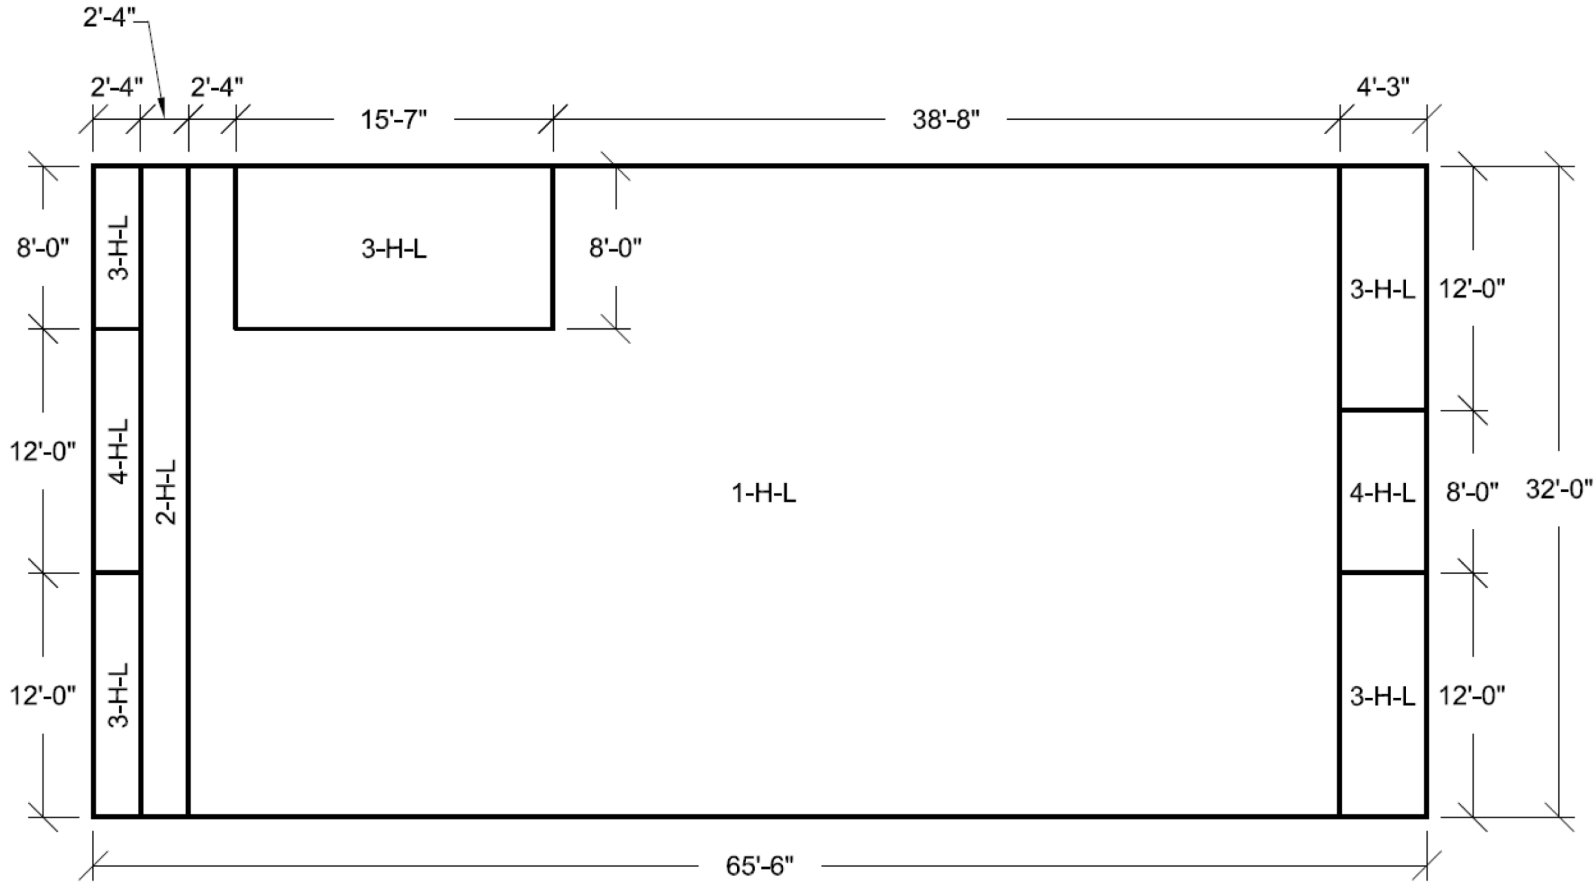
H.6-168 DGFOSV Wall 8 Looking From Outside
